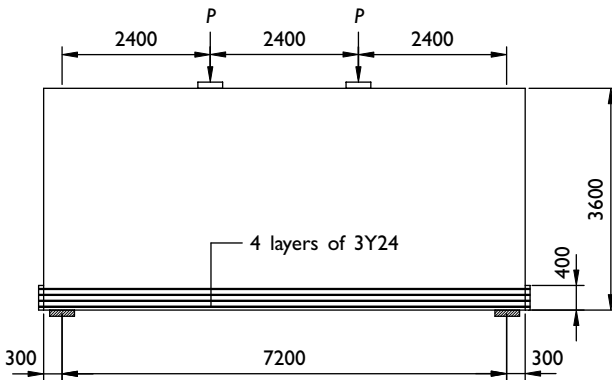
Layout of main steel reinforcement with anchor plates in the deep beam under two-point loads.
